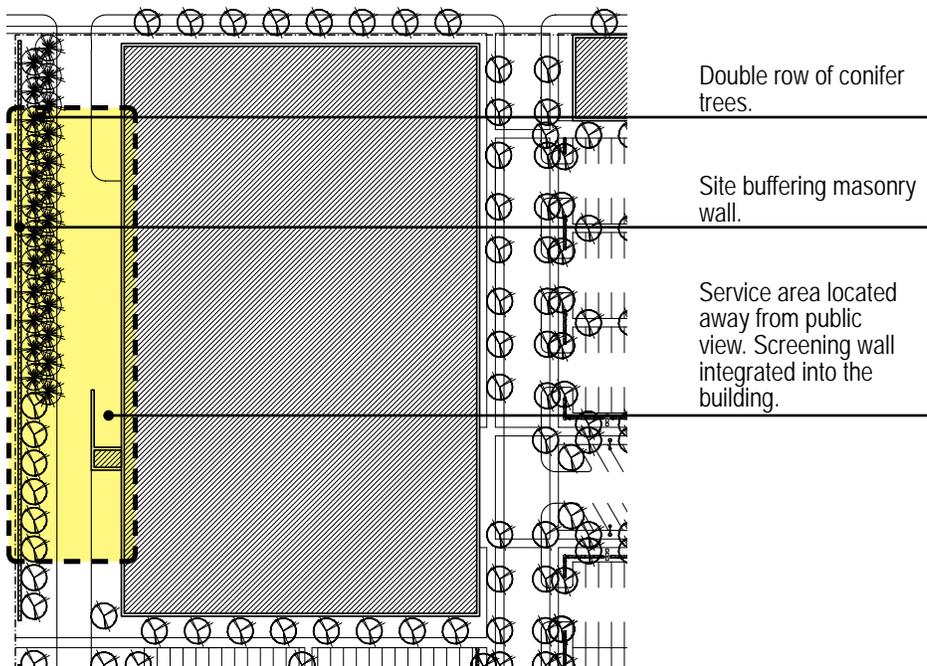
D : Site design diagram showing a potential service area configuration.
